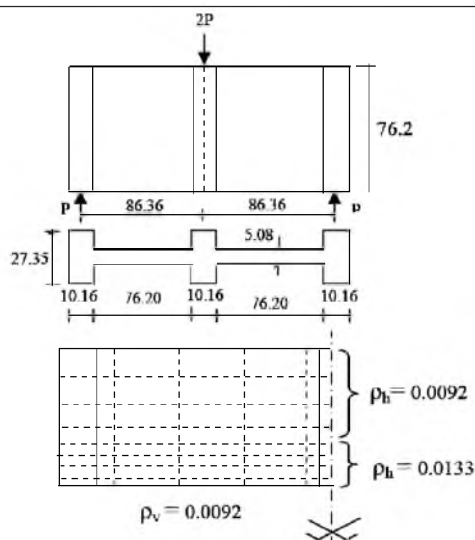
Geometry, loading, and panel reinforcements. (Dimensions in cm.)
